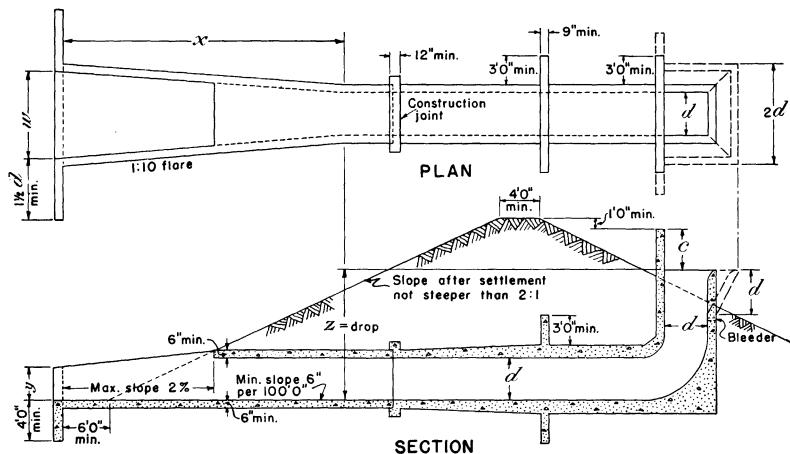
The drop-inlet soil-saving dam with square culvert. The following specifications are recommended: Square culverts should be 2 by 2 feet or larger. If smaller sizes are required, round culverts are used. The outlet width,  $w$ , should equal the culvert width,  $d$ , plus 6 feet, except for a culvert 2 feet square, in which case,  $w$  equals 6 feet. The length  $x$  of the flared outlet equals the shorter of  $10d$  or 30 feet;  $c$  equals the highest expected flood crest in feet over the inlet lip plus one-half foot.
